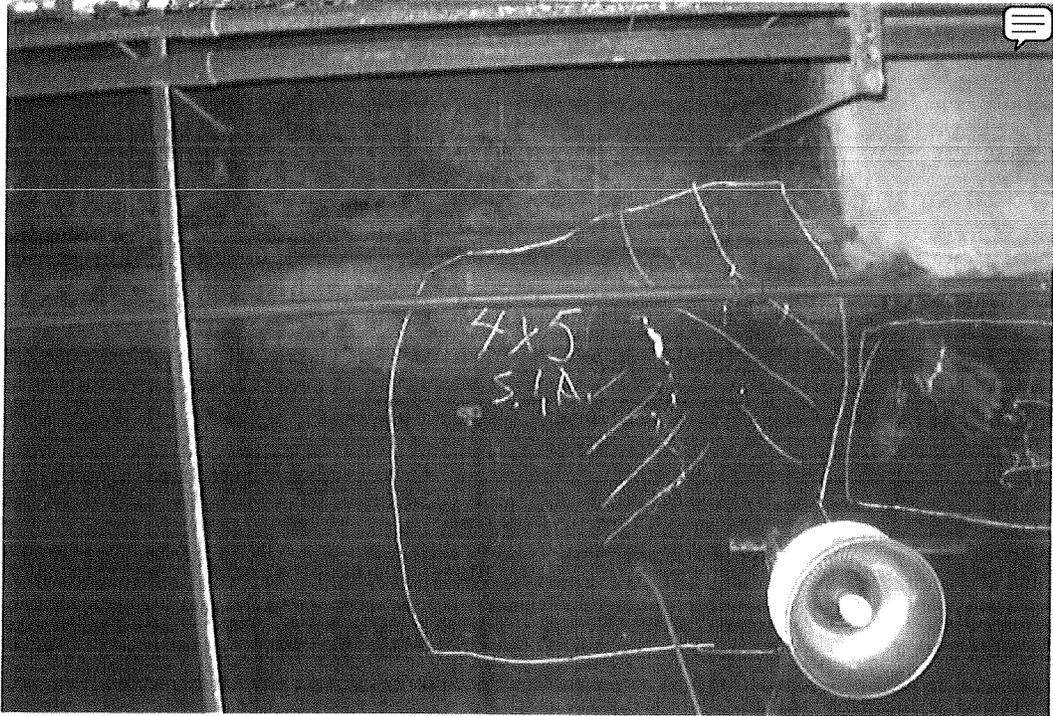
Cracked and hollow sounding concrete slab at the underside of the Fourth Floor. Between Column Lines 9/10 and K/L. (Approx. 20 SF)
